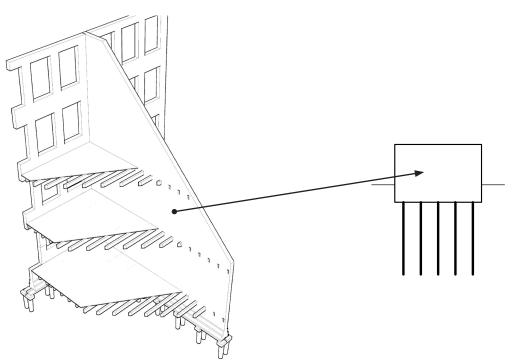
Schematization of masonry load bearing wall (by author).
